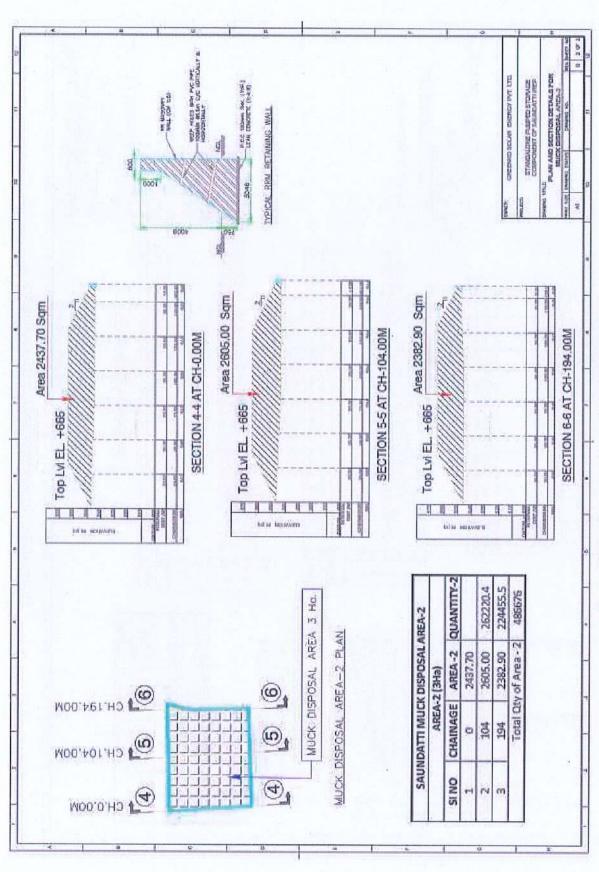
Cross-sections of Muck Dumping Site-2
